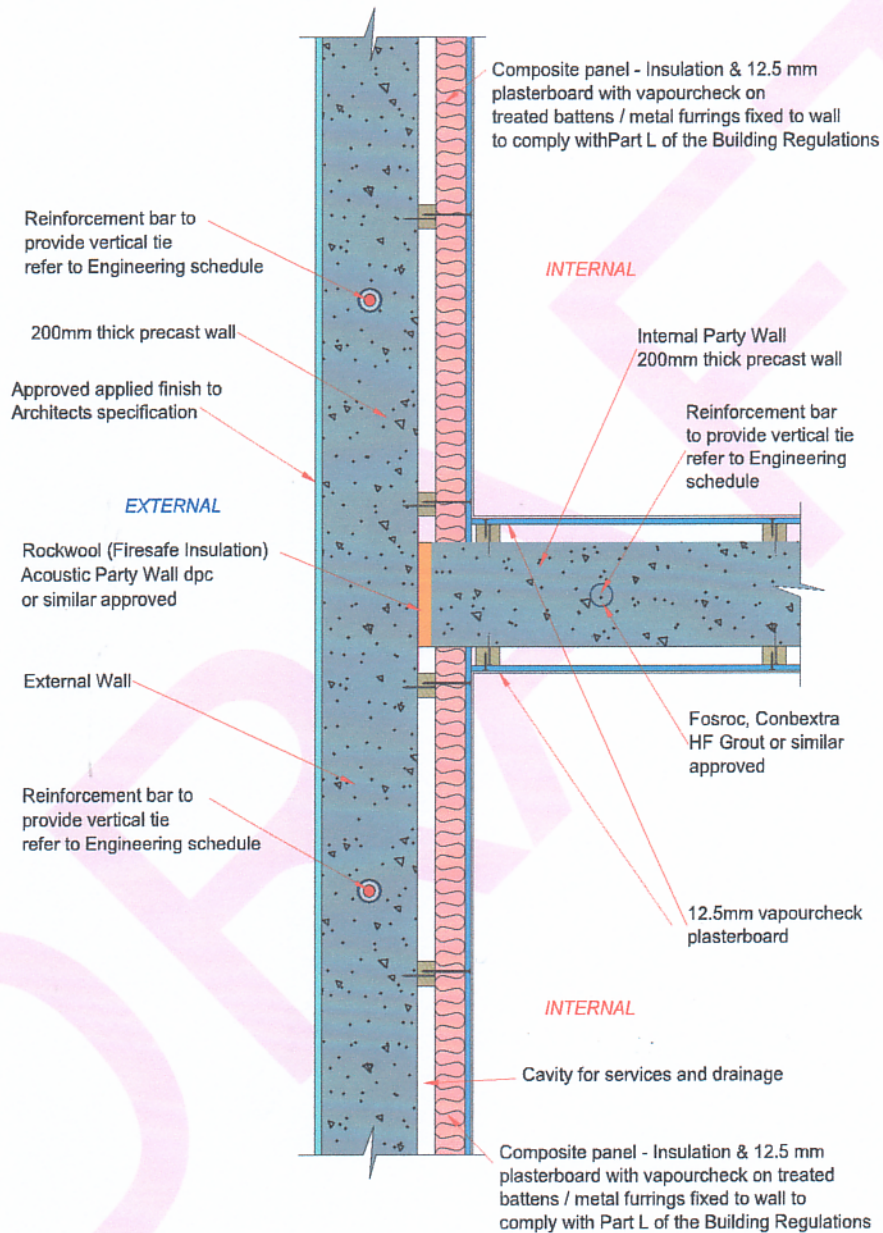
Typical Vertical Joint Detail at Party / Perimeter Wall (Plan)
